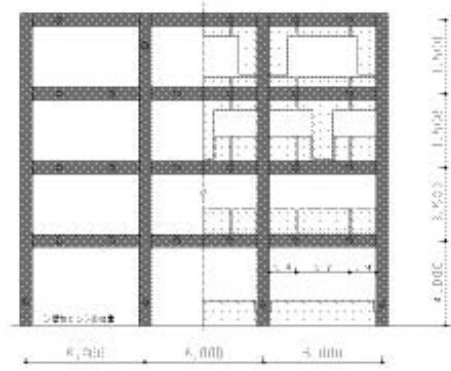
Plastic hinge location to double horizontal strength of multi-layer multi span frame
